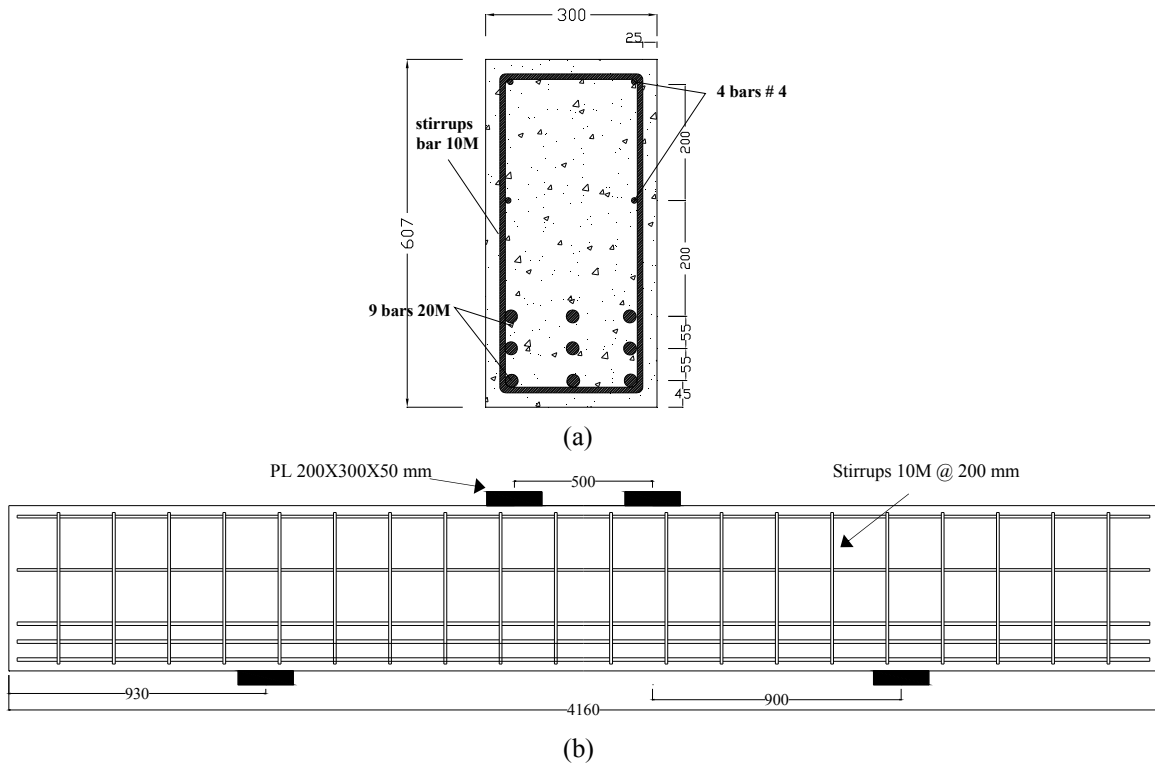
Beam NS2-4: (a) Cross section (b) Elevation
